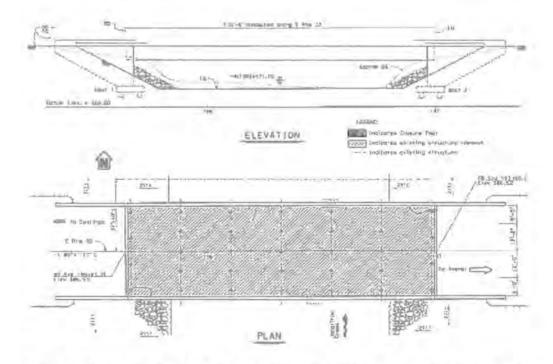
Plan and Elevation Views of the proposed replacement bridge. Not to Scale.
